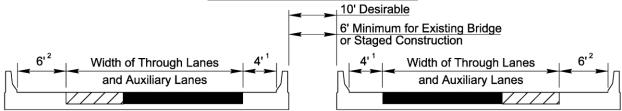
Arterial System Bridge Deck Widths for Four or More Lanes Divided Shoulder Approach and Curb and Gutter Approach with Auxiliary Lanes
